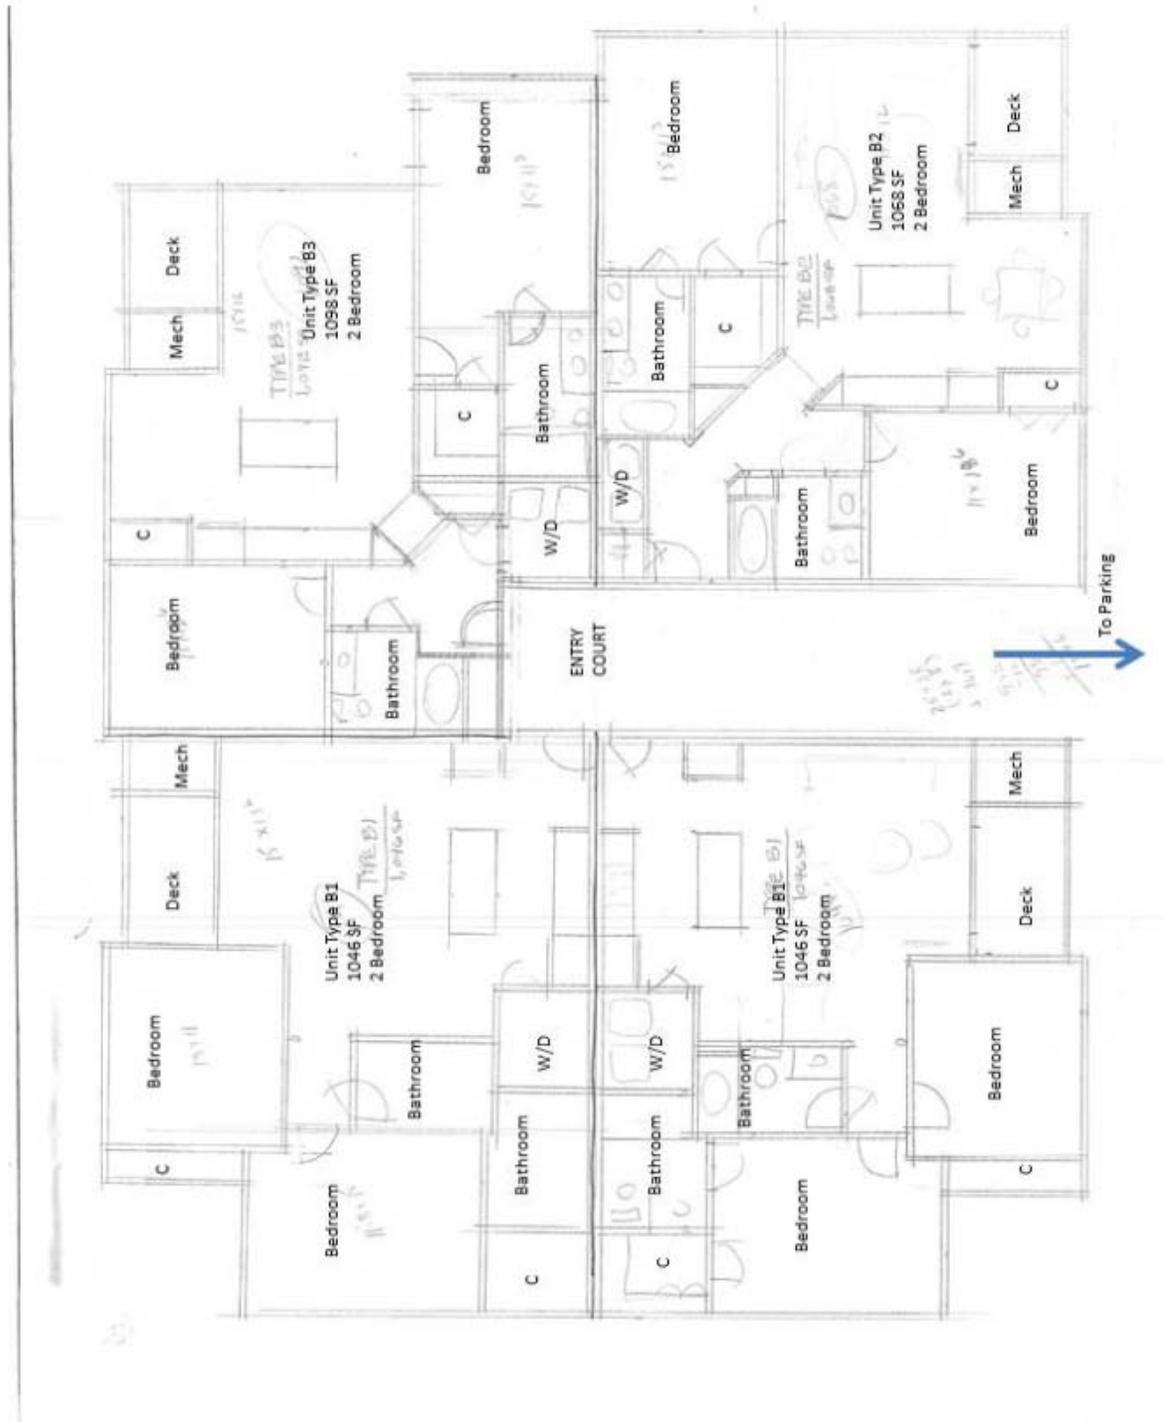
TYPICAL FLOOR PLAN- MODULE B
